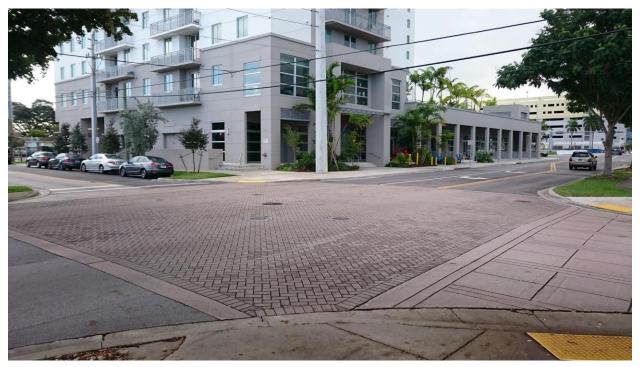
SW 7th Street & SW 109th Avenue Intersection looking Southeast
